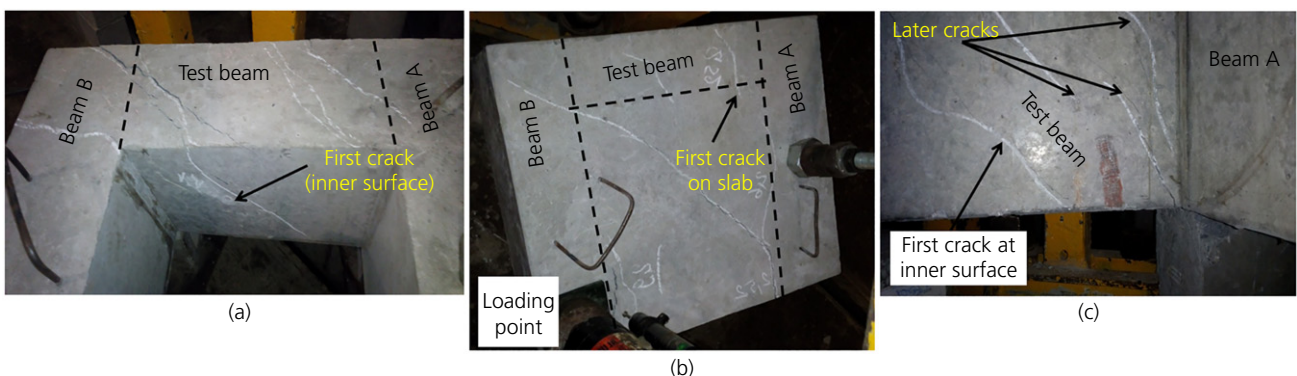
Crack patterns of specimens M3 (without slab) and M4 (with slab): (a) M3 (cracks at top and inner surfaces); (b) M4 (cracks at slab top surface); (c) M4 (cracks at test beam inner surface)
